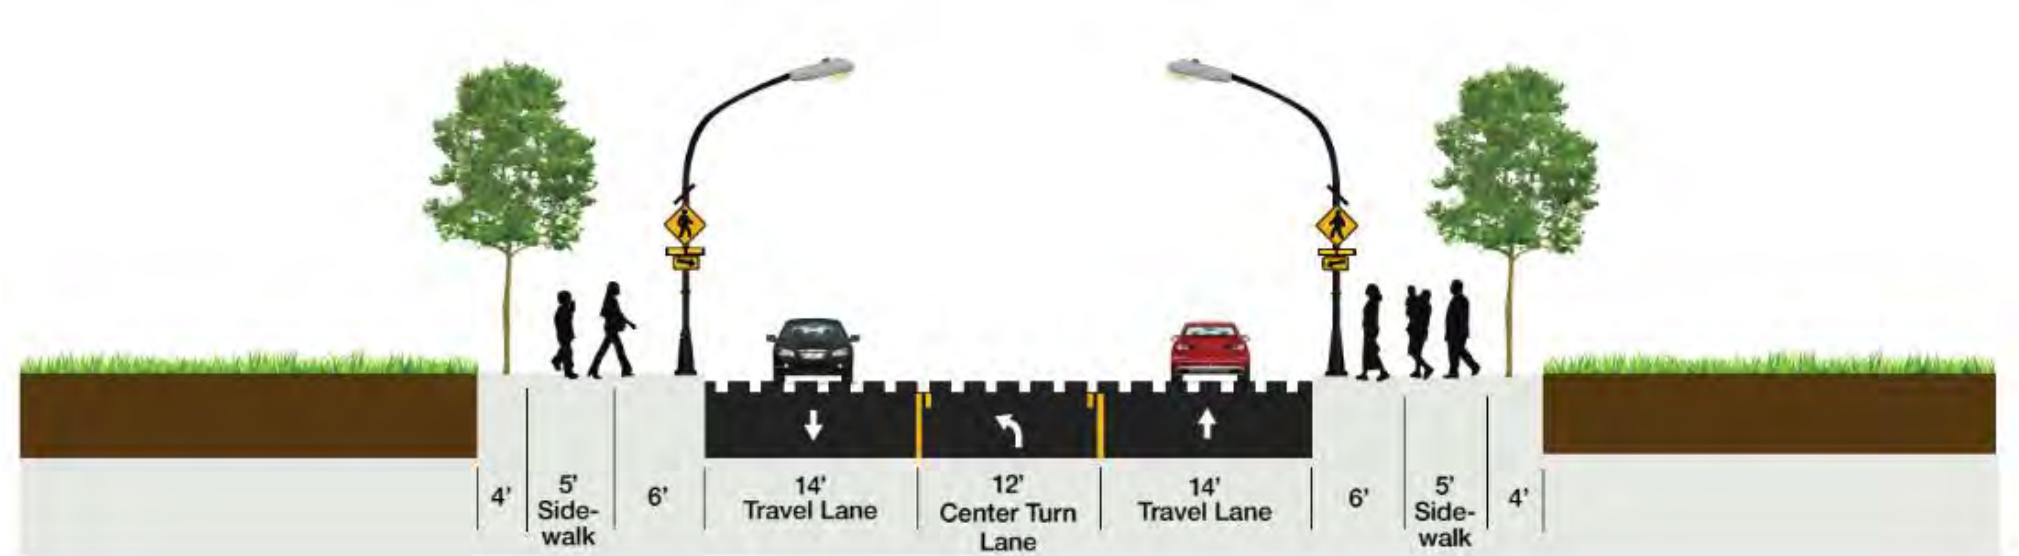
Martin Street Cross-Section with Rectangular Rapid Flashing Beacon (RRFB) and Overhead Lighting
